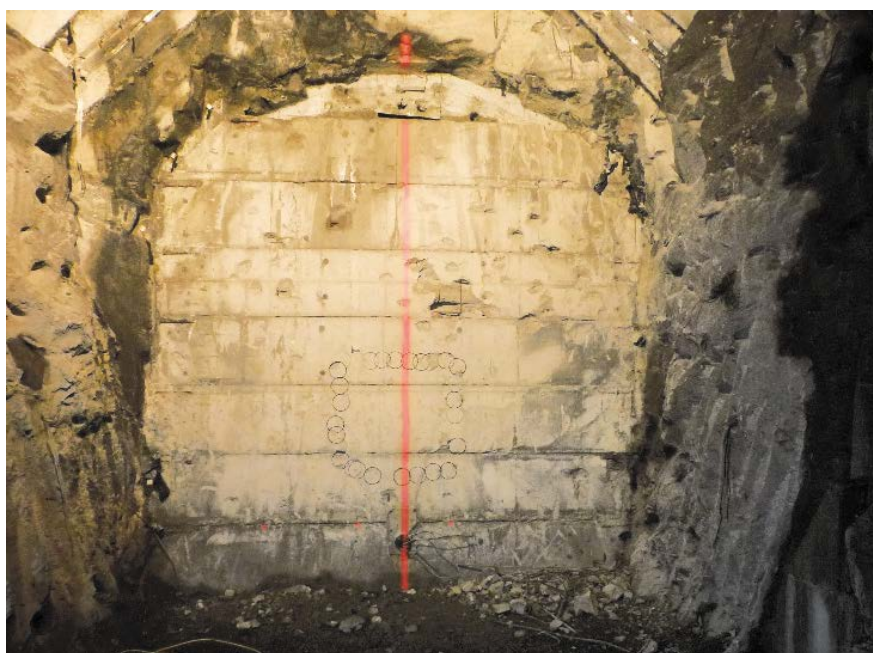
Photo showing the concrete beam wall after removal of the concrete dome.
